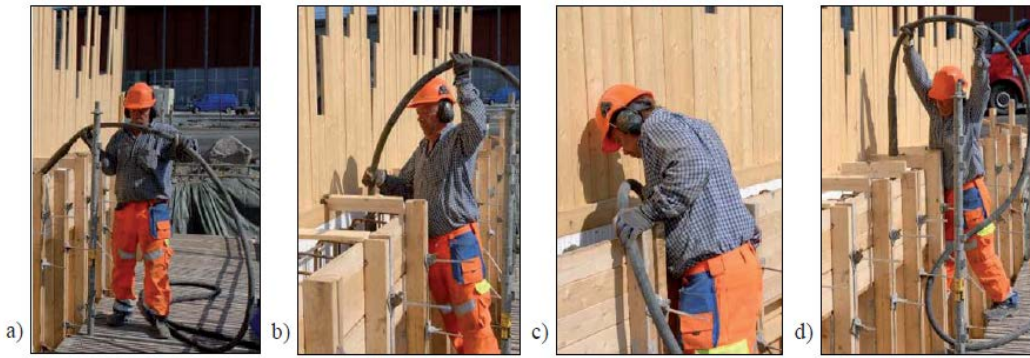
Work postures when compacting traditional concrete in wall structure. a) Lifting the poker vibrator to the formwork, b) Lowering and/or raising it into/up from the formwork, c) Checking if concrete is vibrated enough, d) Lifting the poker vibrator to the next spot for vibration.
